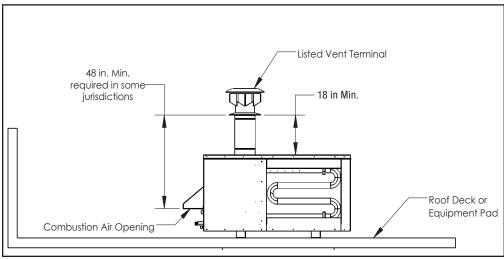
OUTDOOR VERTICAL VENTING
